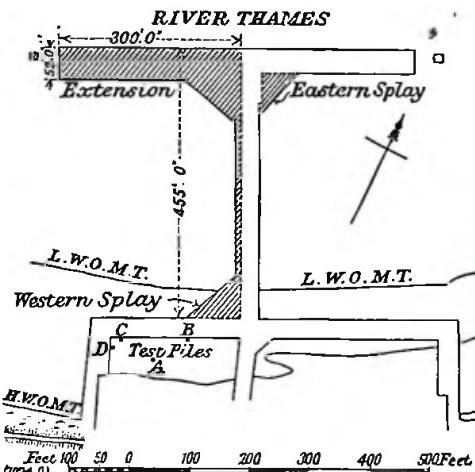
Site of Pile-Driving Tests, Greenhithe.
